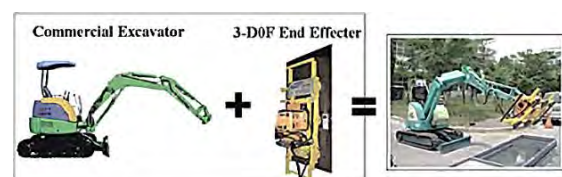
Schematic of curtain-wall installation, source: [YU05]
